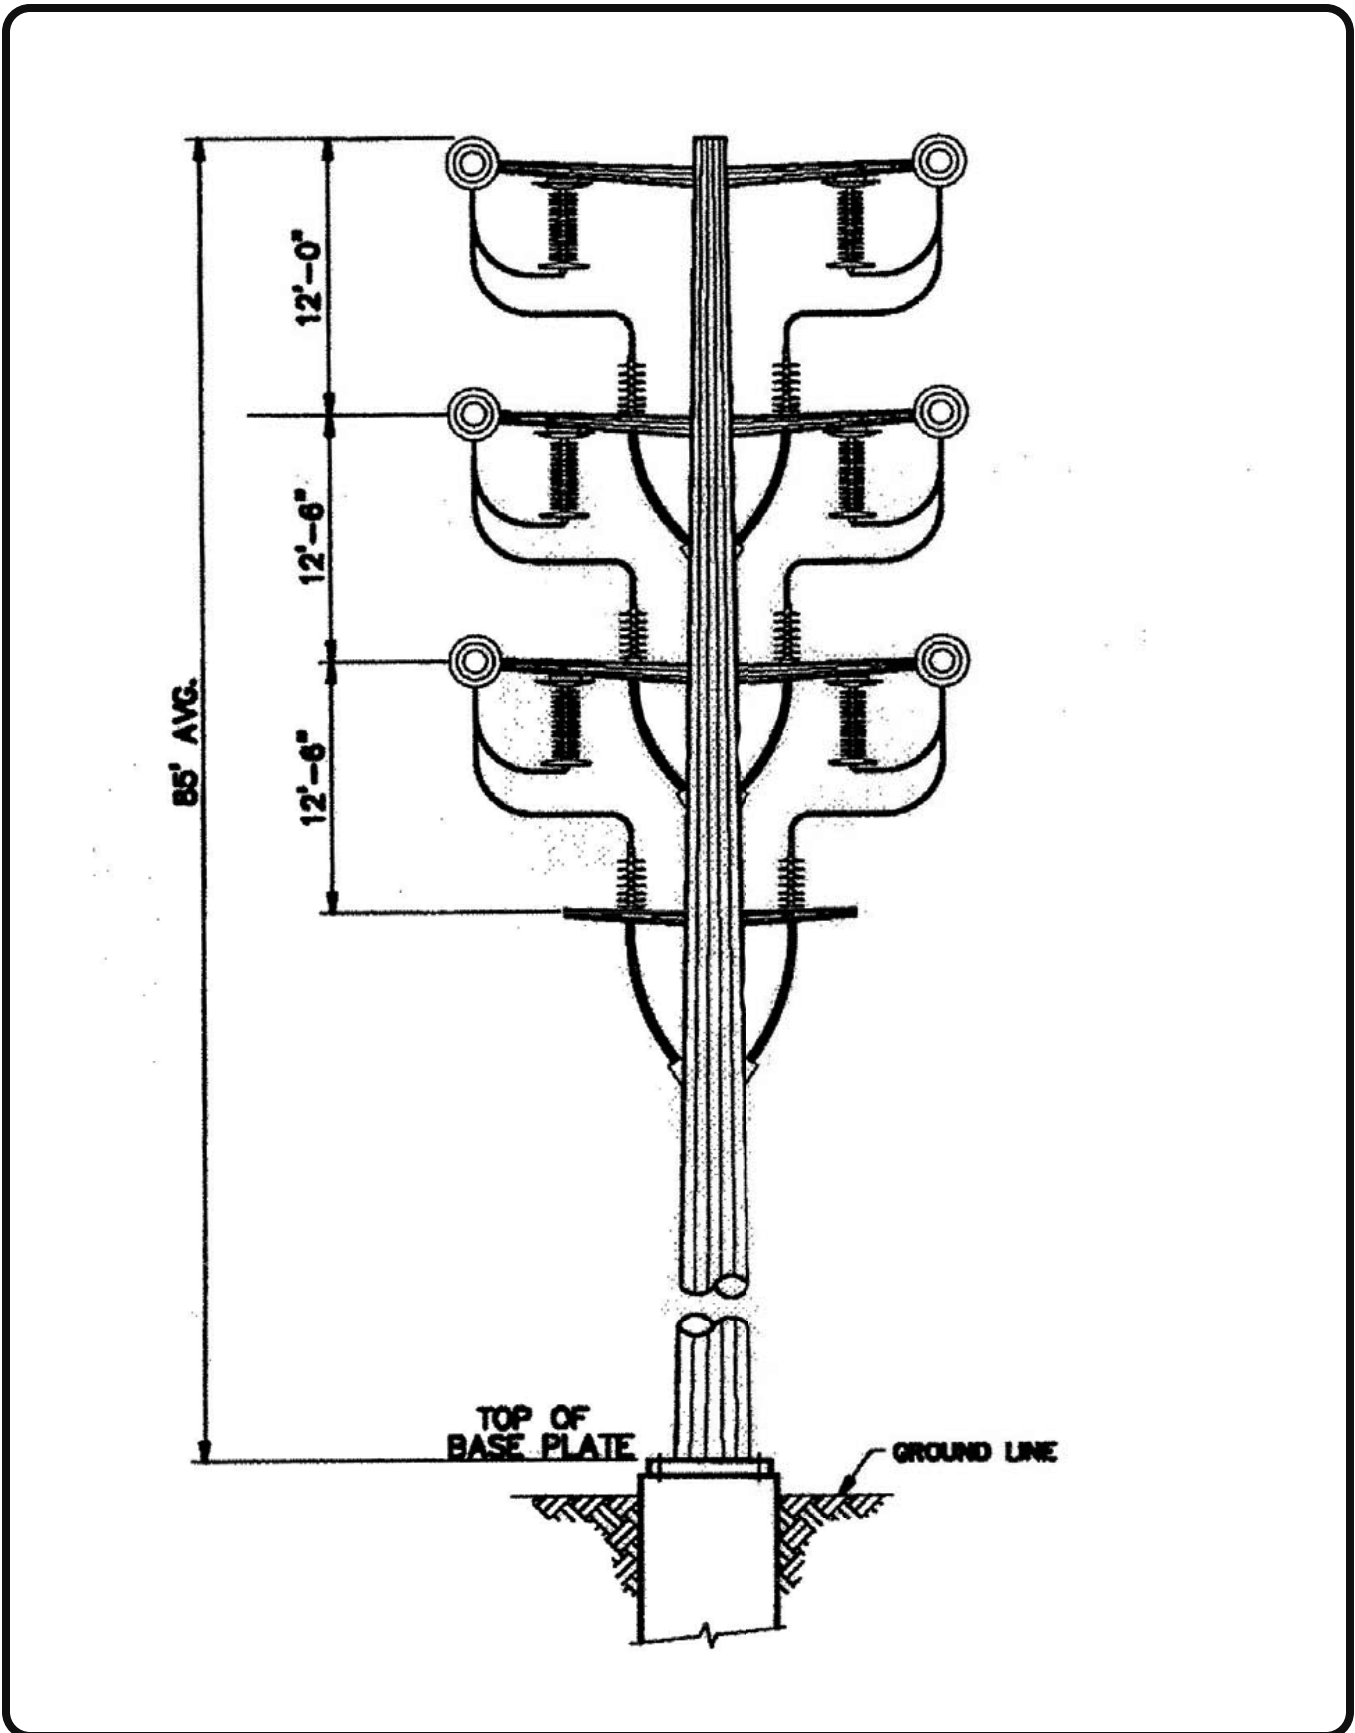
Proposed 69 kV Steel Riser Pole Typical Drawing
